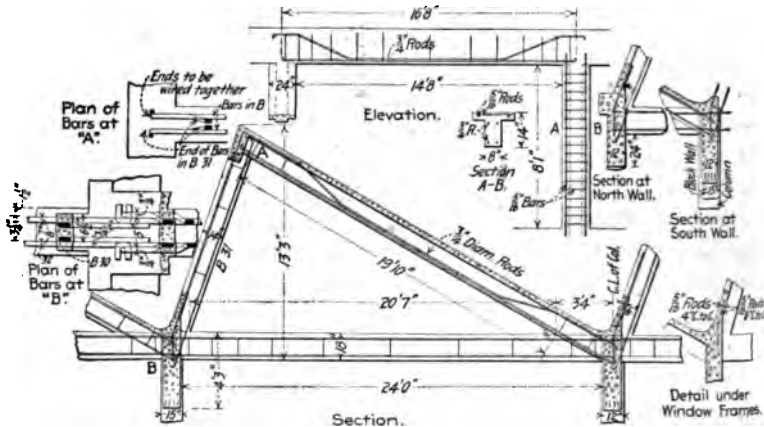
Section of Saw Tooth Roof for Factory at Stamford, Conn.
